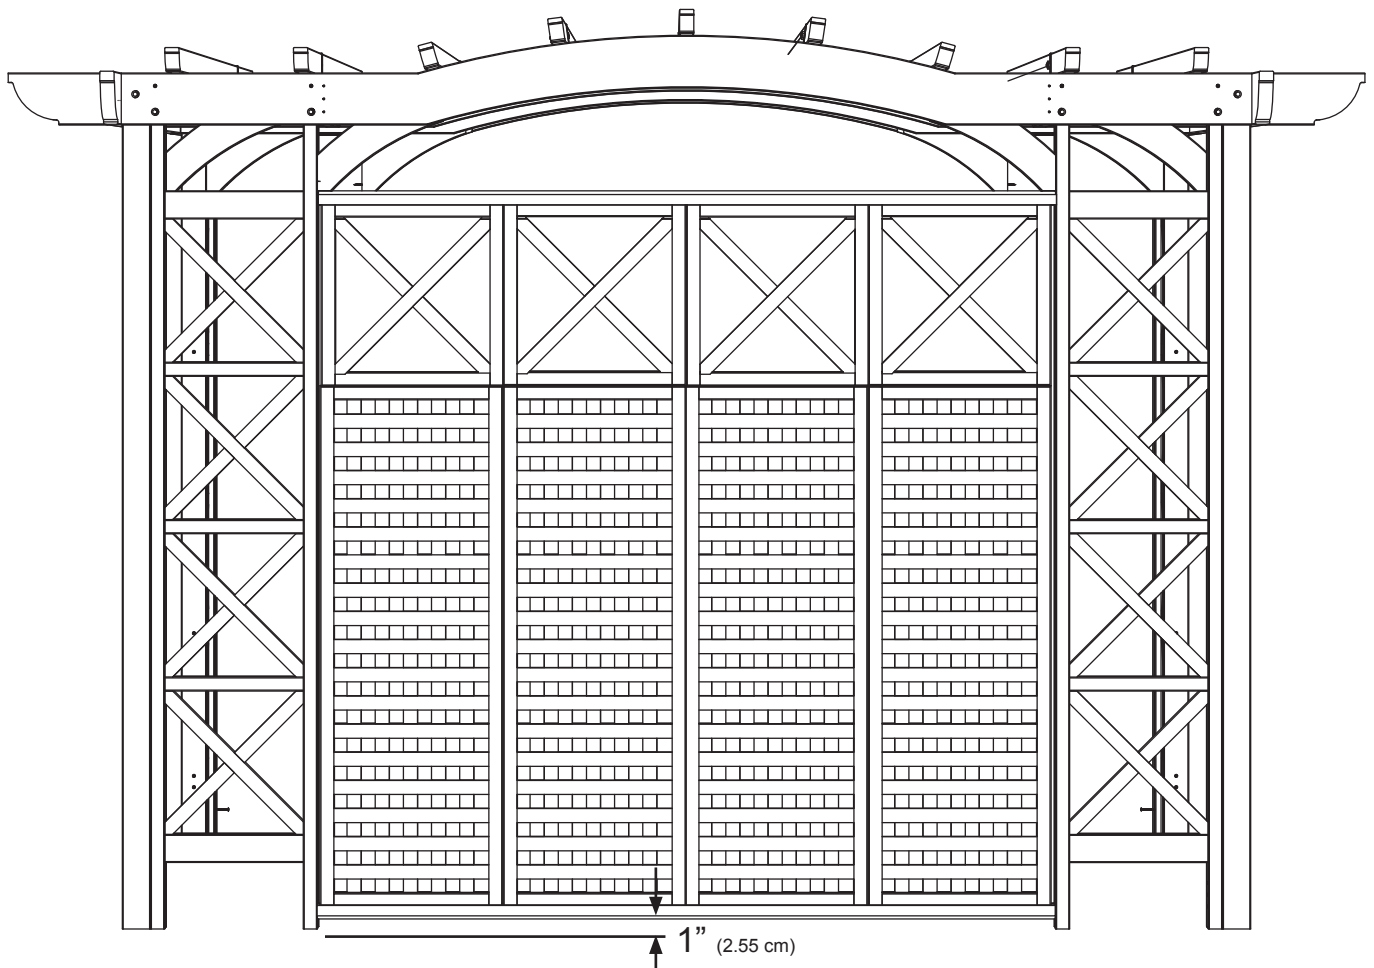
Predrill Holes and Fasten with S5- 1" Pan Head Screw
